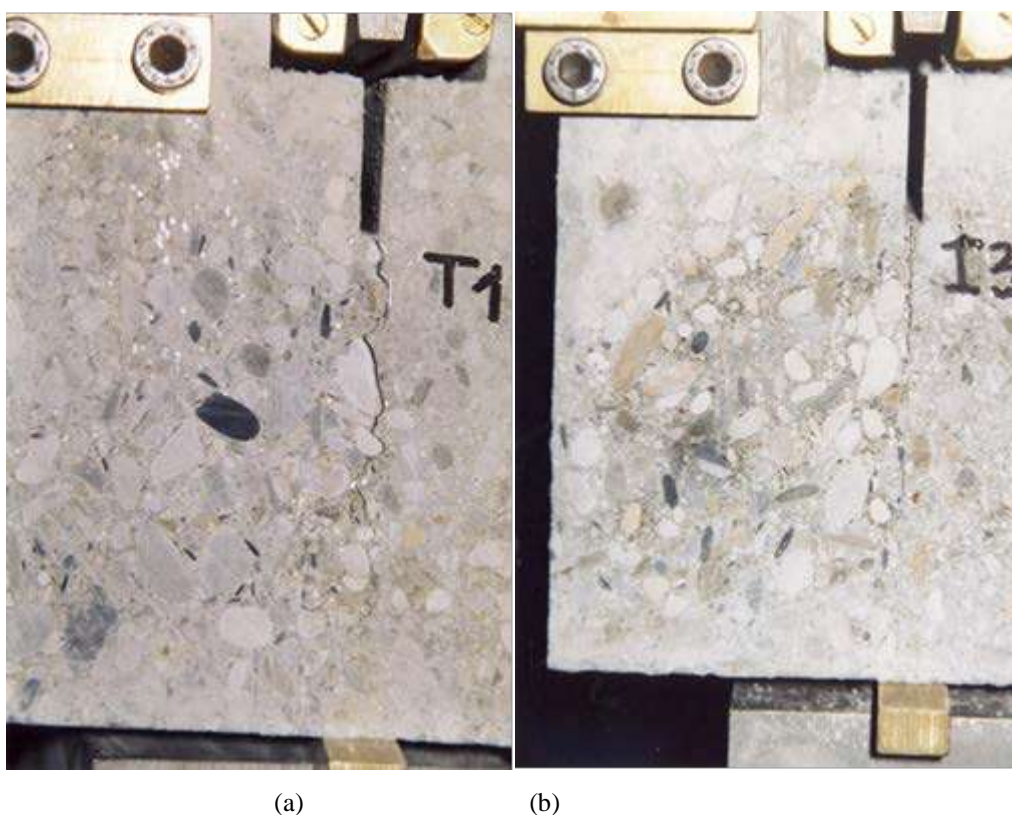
Surface photographs of concrete cubes after wedge splitting test: (a) concrete without mineral admixture, (b) concrete with added silica fume [16].
